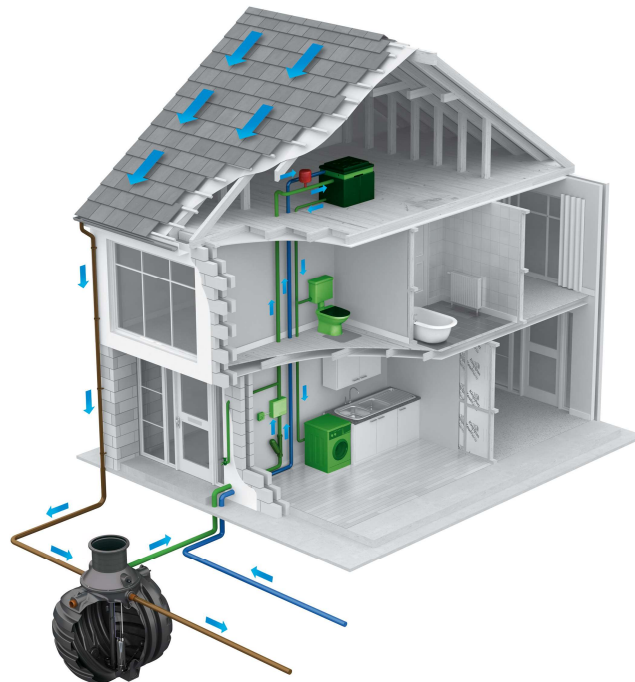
Kingspan Rainwater Harvesting System: Domestic Use (Source: Pickworth, 2014)
